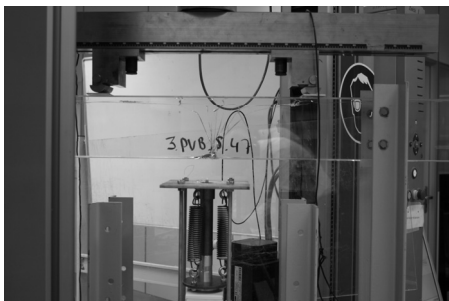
Typical model level II damage in 3.PVB.S specimen.
